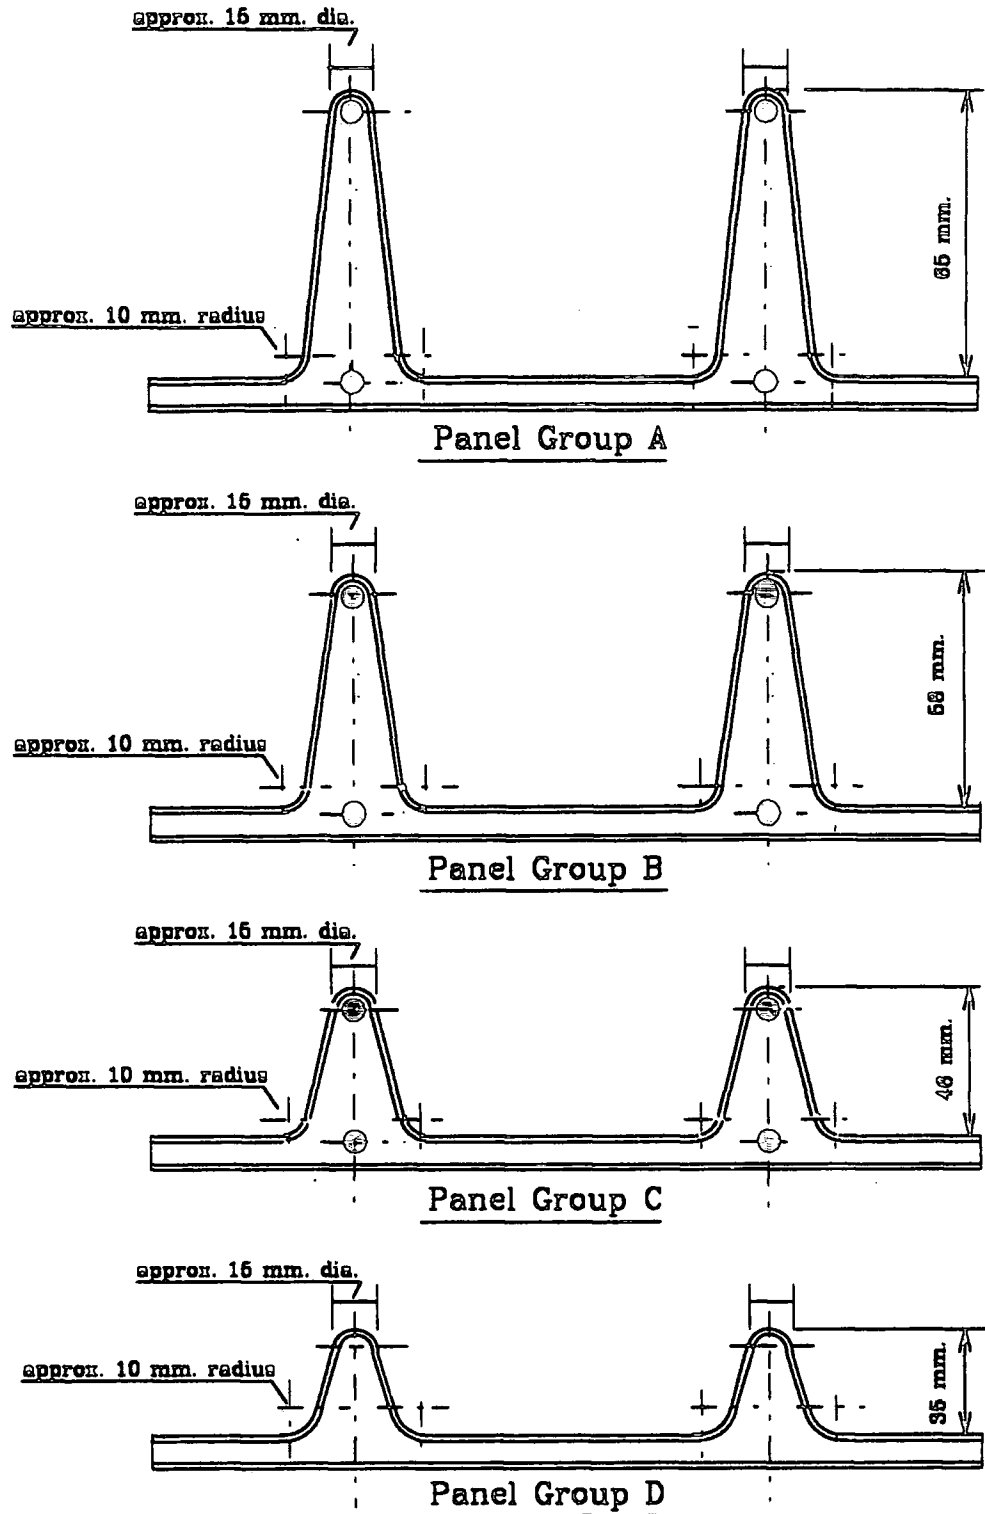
Schematic layout of the Phenolic Concrete bridge deck panels.
